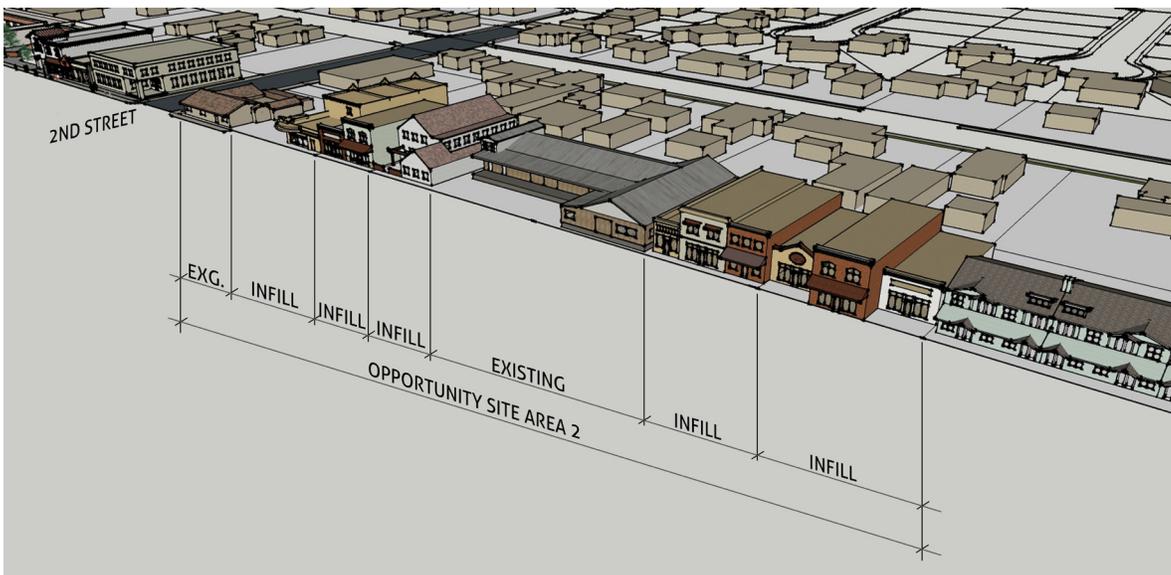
CONCEPTUAL MASSING STUDY, OPP SITE AREA 2
